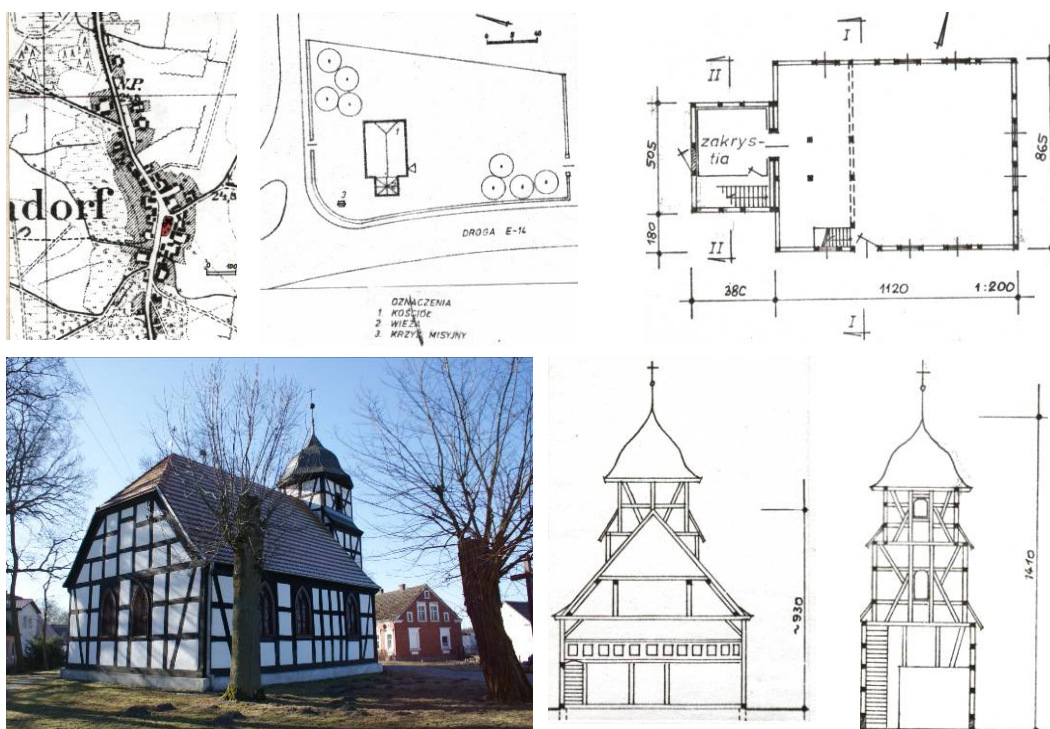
Świeszewo – church floor plan and its present-day view from the south-west side
